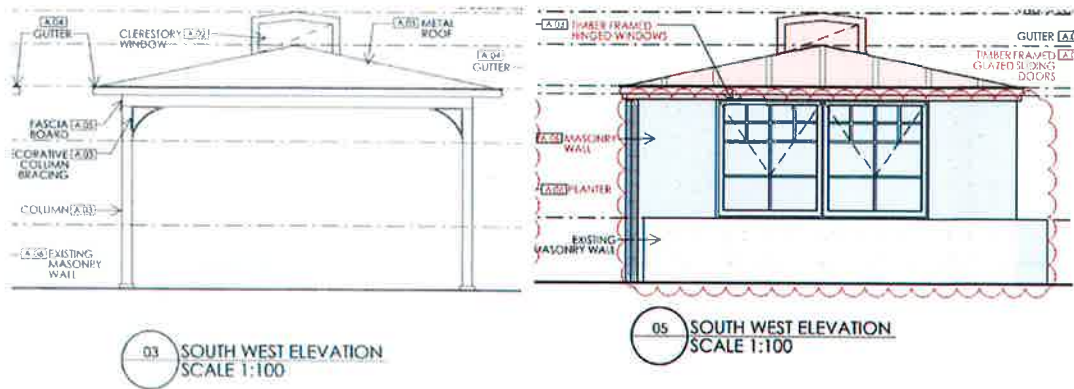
DA approved (left) and proposed (right) South West Elevation (Source: Akin Creative).
